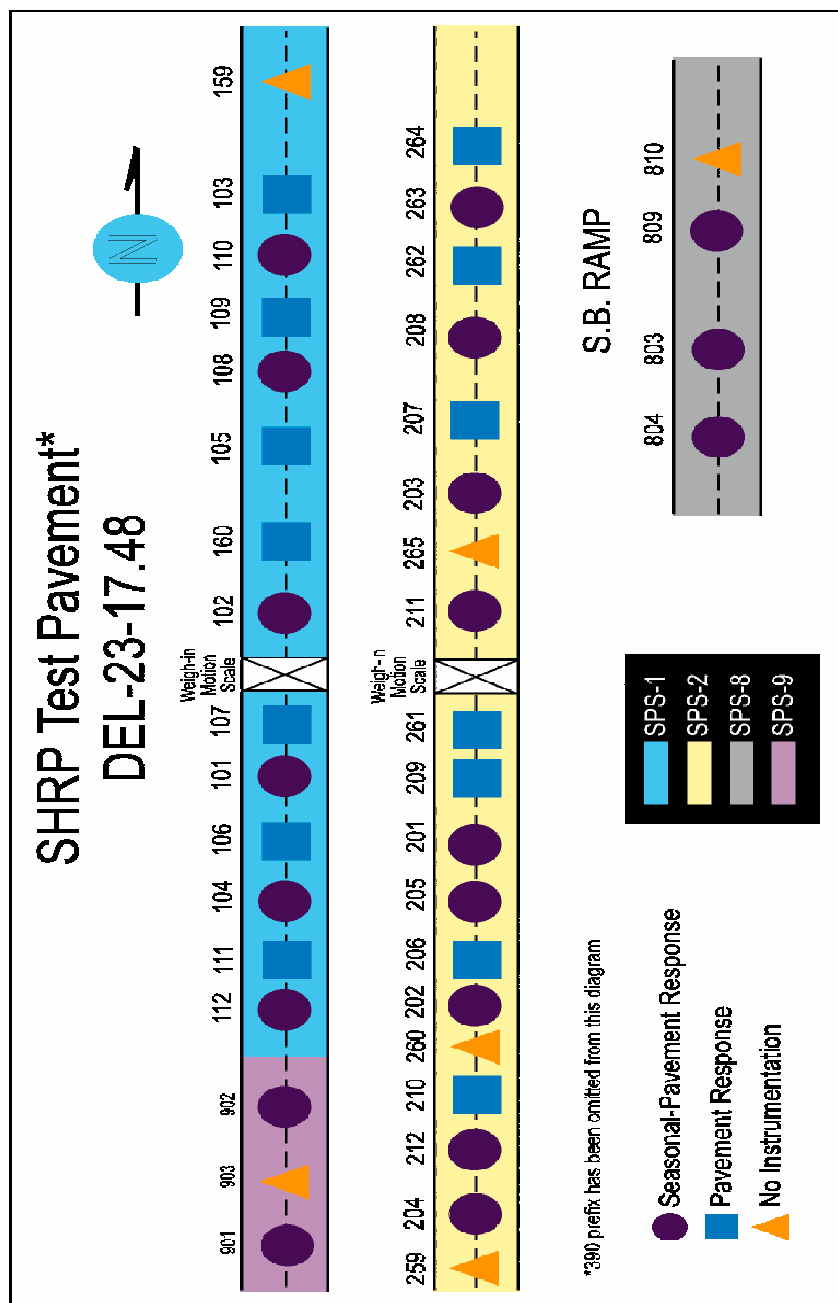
Layout of the Ohio SHRP Test Pavement
